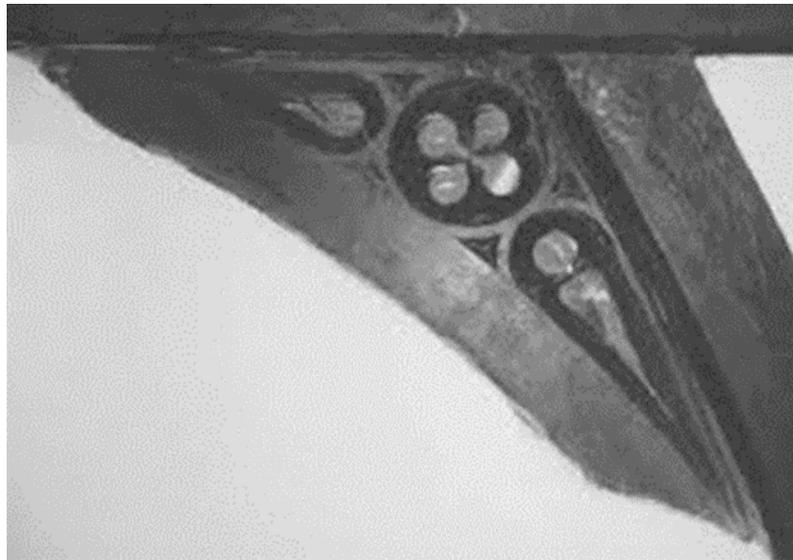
Imberhome Farm Cottages - carved timber detail to roof structure (archive photo)
